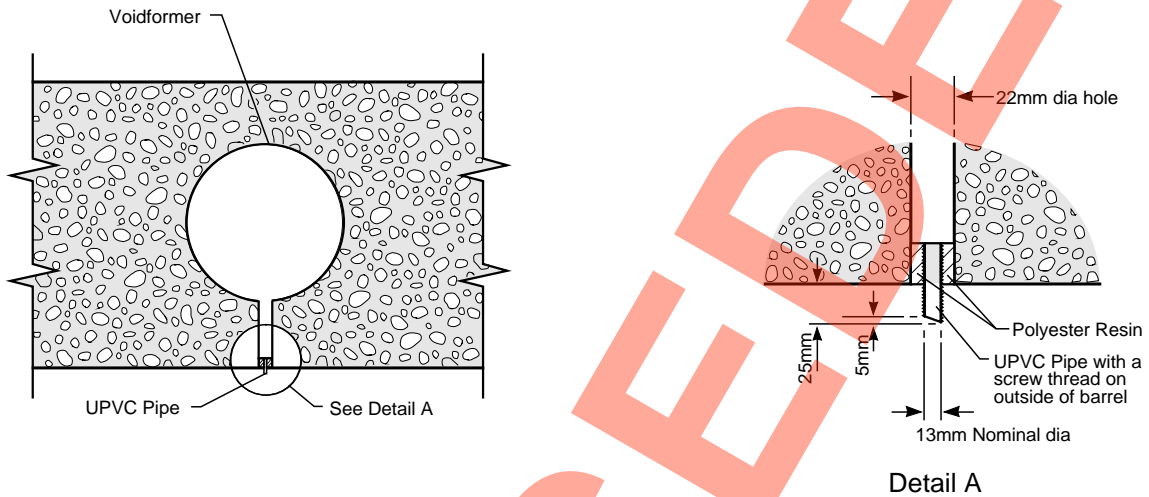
DRAINING OF EXISTING VOIDED SLAB BRIDGES
